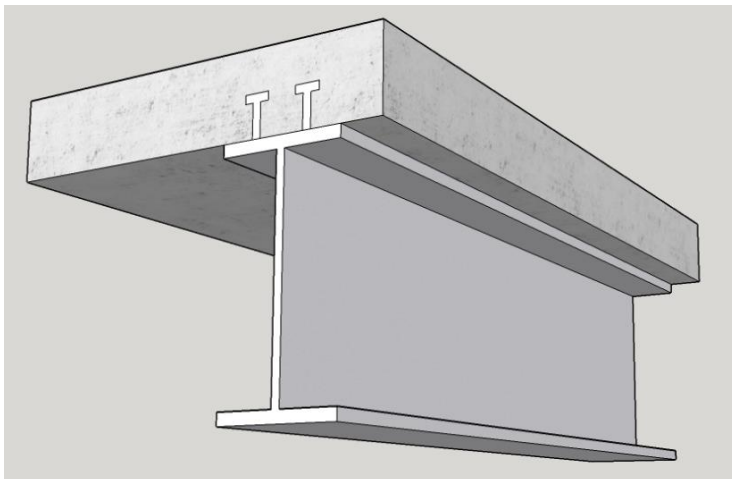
Steel I-beam connected to a concrete slab by shear connectors.
